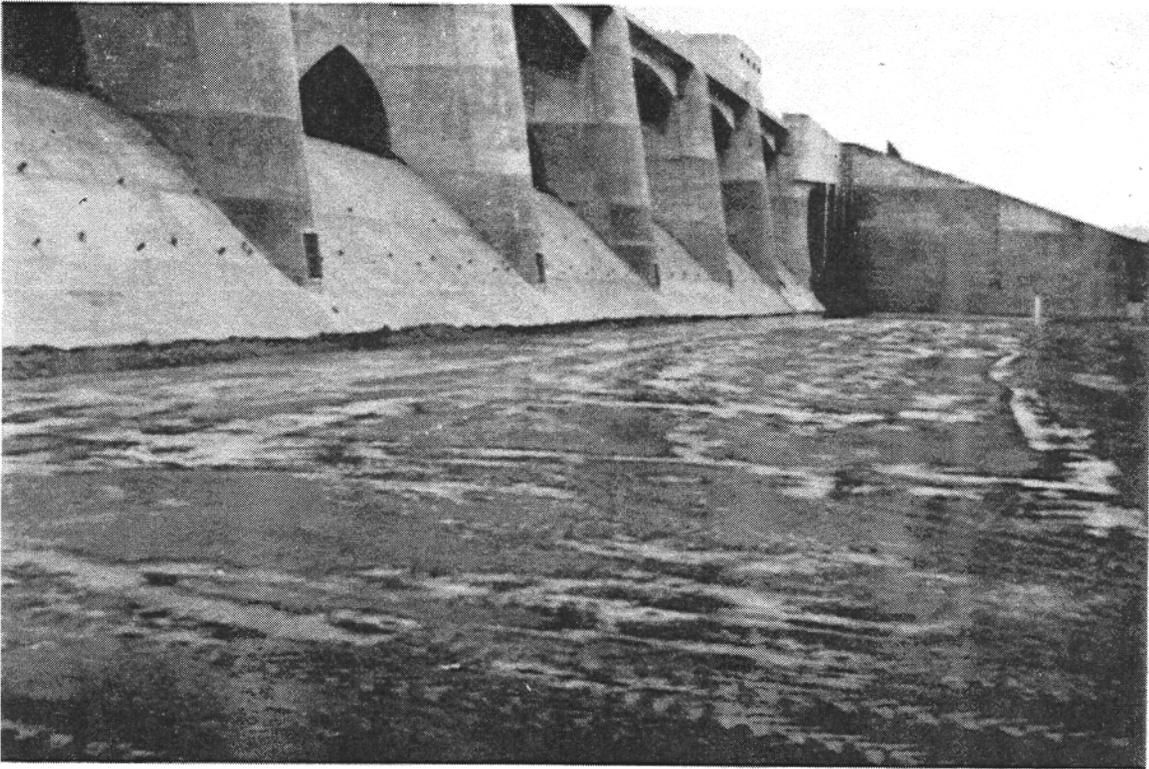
Approach to Spillway, with Spillway at left (view from approach slab to spillway, looking toward southwest).
